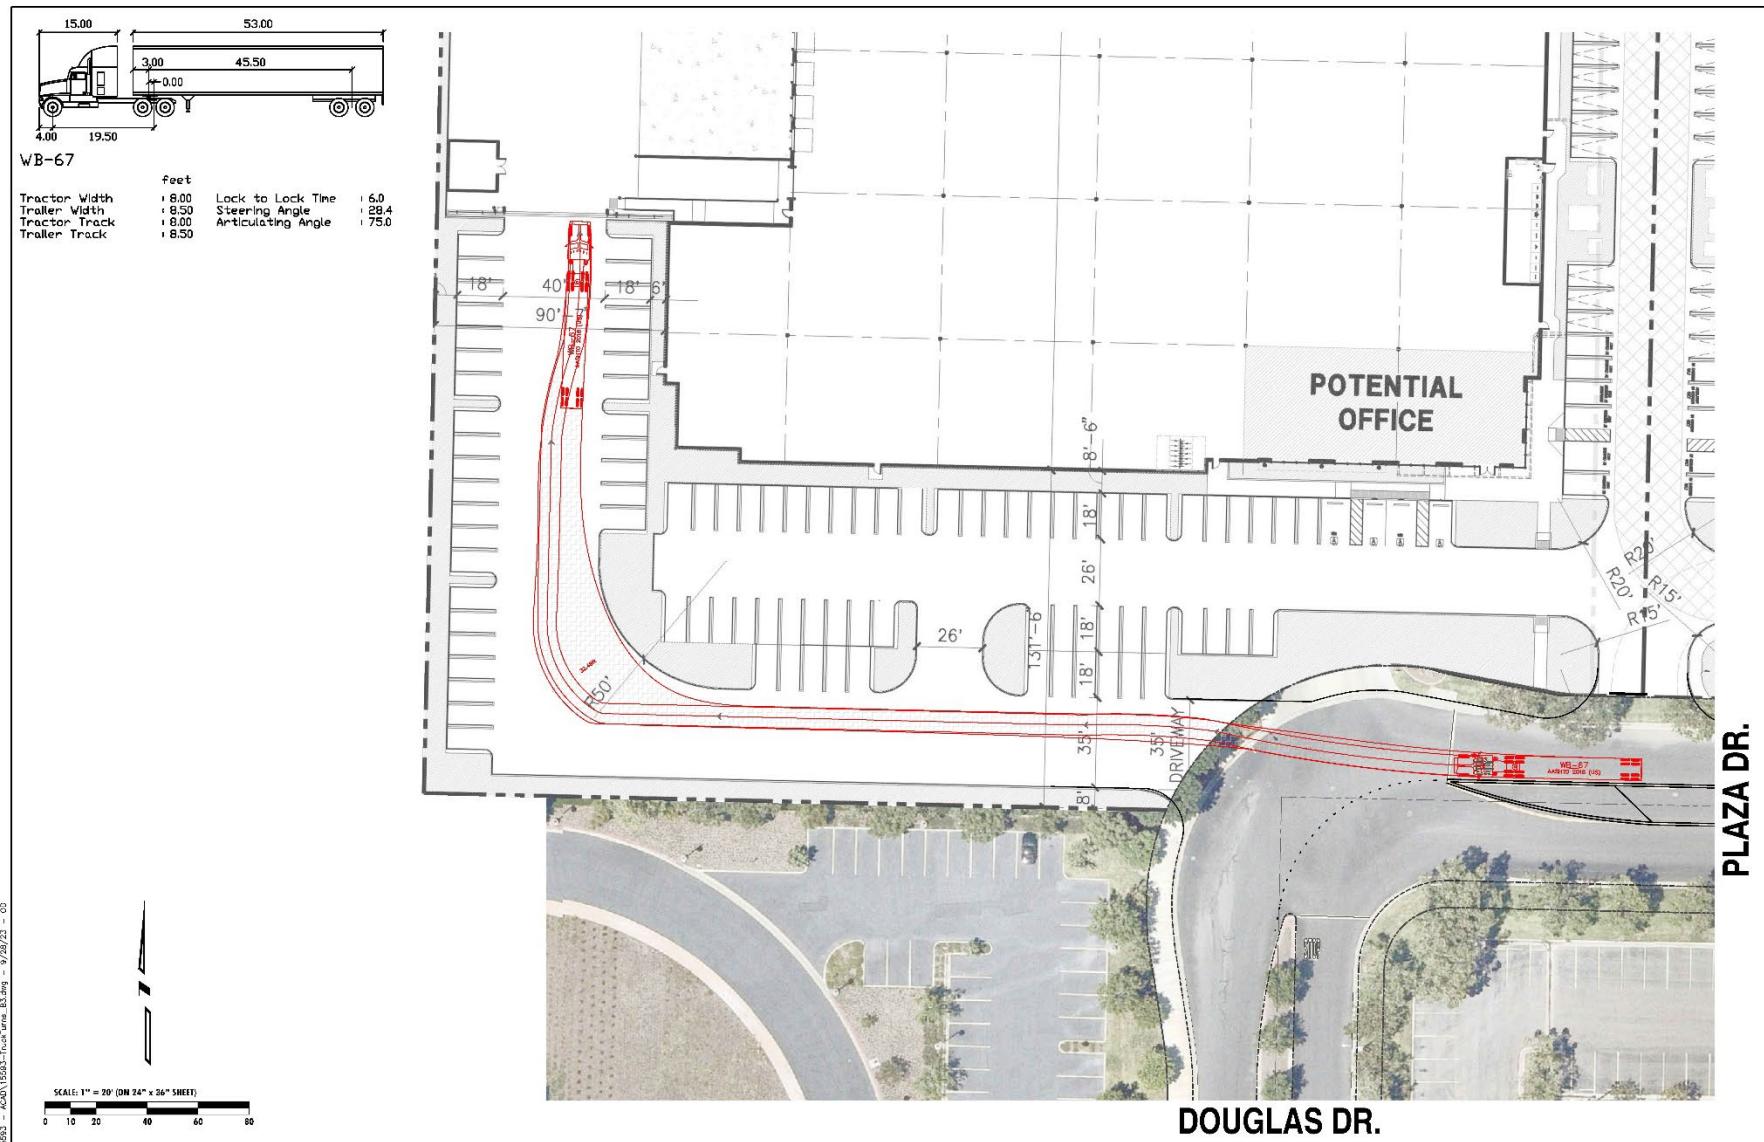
OUTBOUND TRUCK ACCESS AT DRIVEWAY 1
